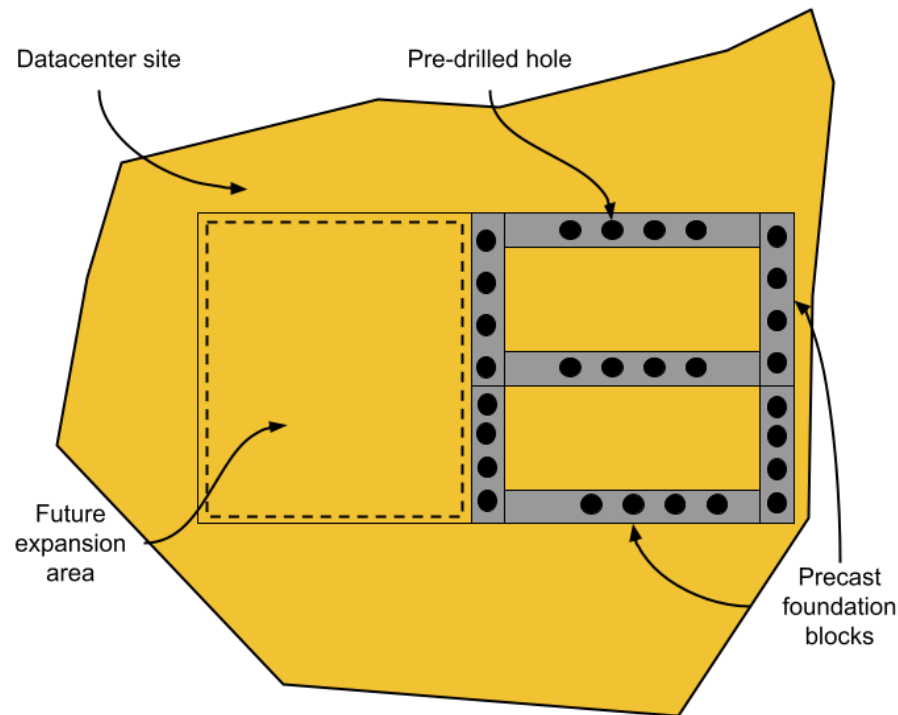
Precast foundation blocks utilized for datacenter foundation construction
